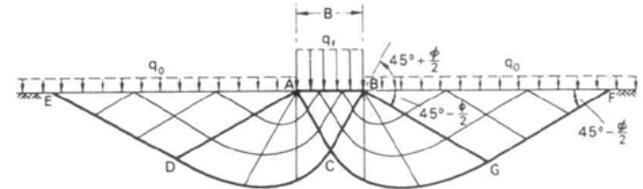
Failure Mode under a Strip Footing
